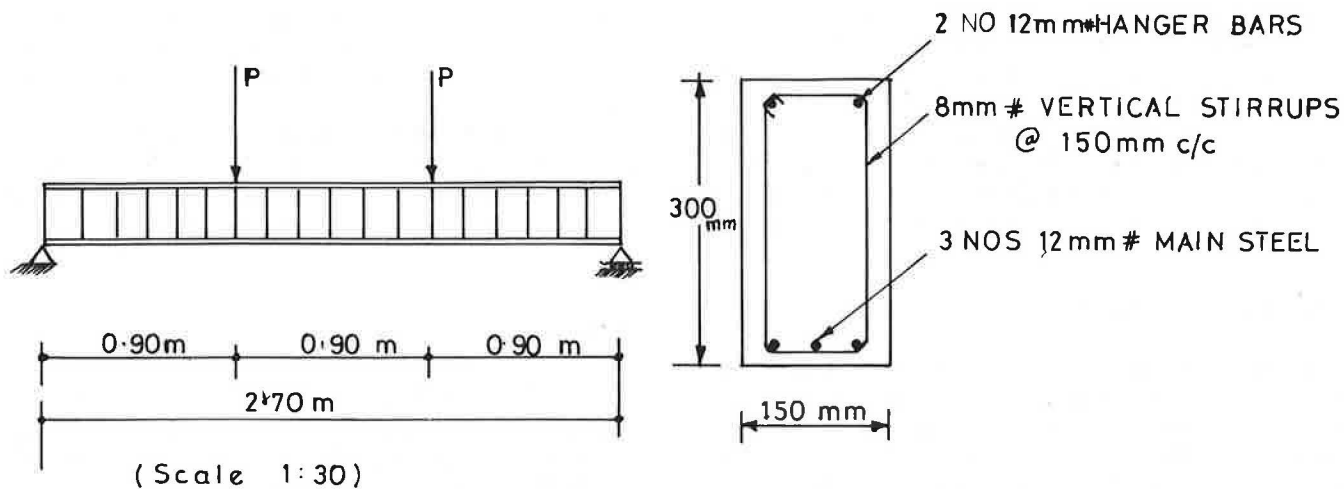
Details of cross section and loading of reinforced concrete beams.
